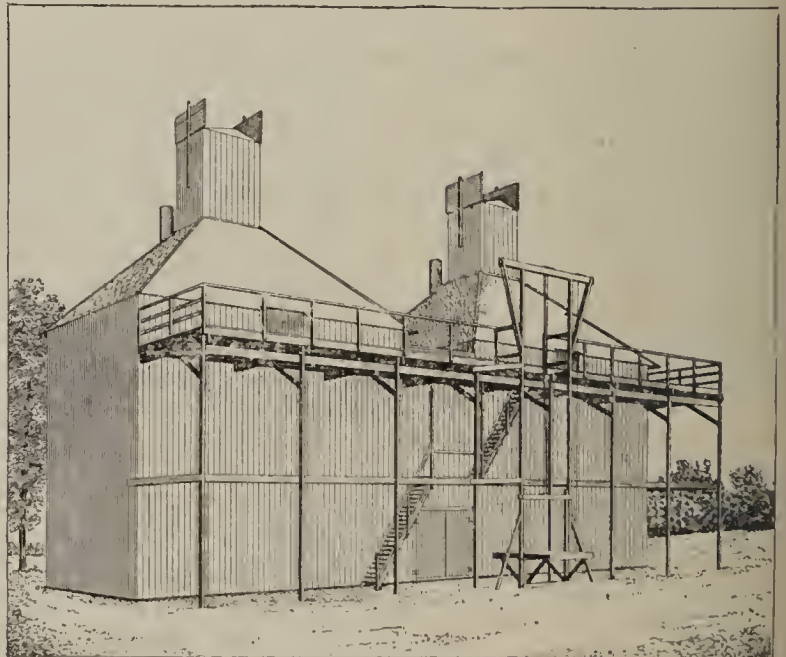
Perspective of stove kiln the plans of which are shown in figures 6, 7, and 8.
